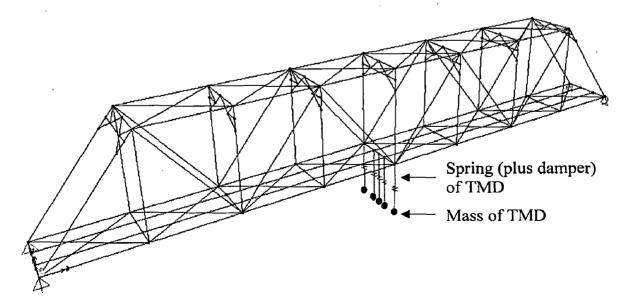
Arrangement of TMD system containing 5 TMD with the bridge model.
